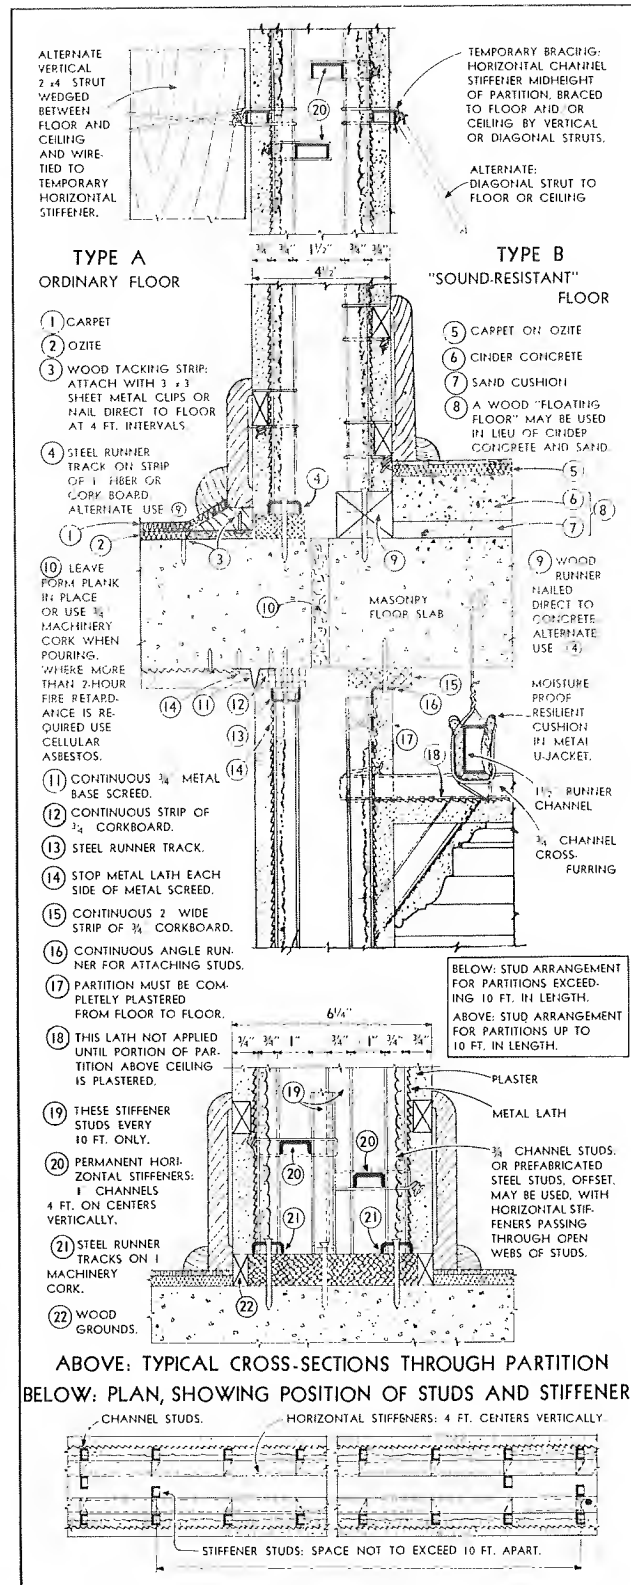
Insulation Details of Metal Lath Double Partitions In Ordinary and Sound-Insulated Floor and Ceiling Construction, Showing Insulation of Runner Tracks.
